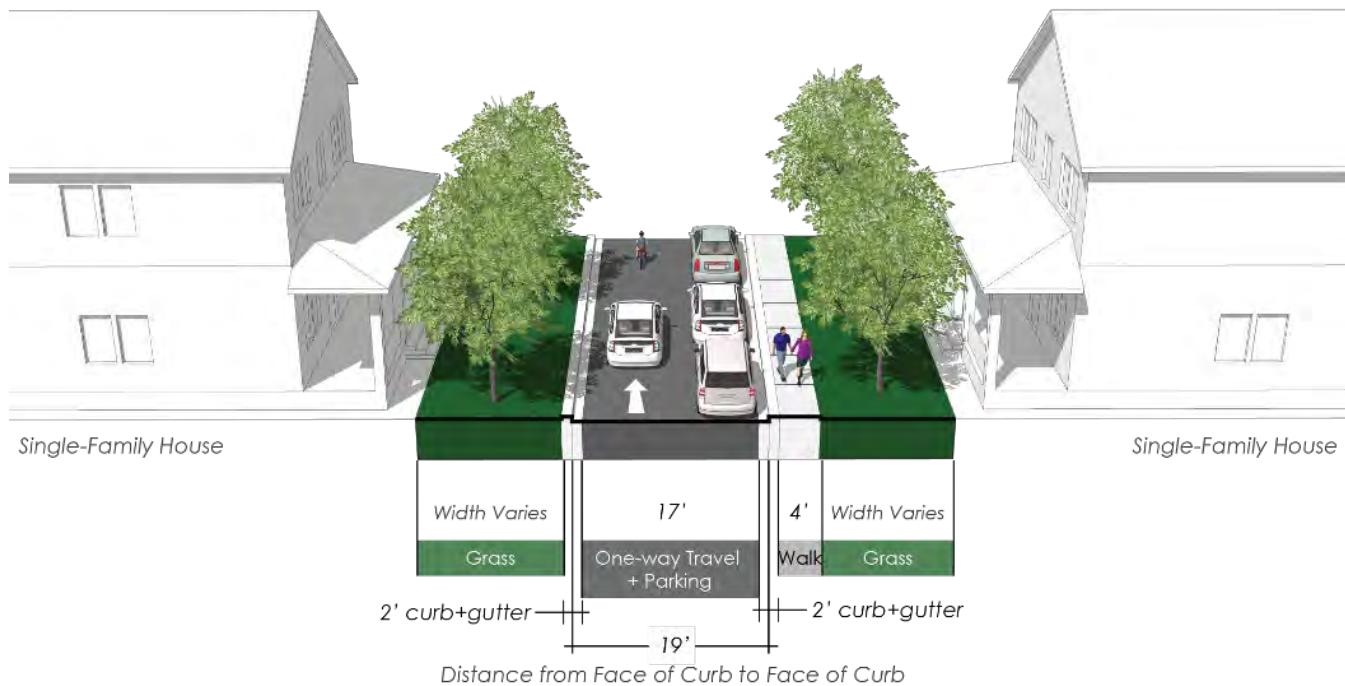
Cheltenham Drive – Tilbury Street to Pearl Street (Looking East)
